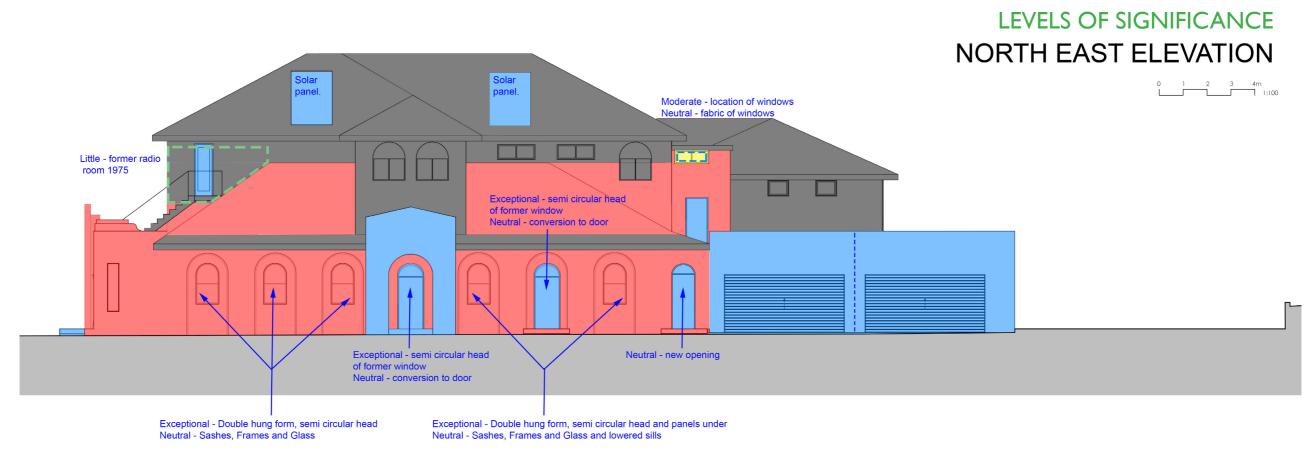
LEVELS OF SIGNIFICANCE OF BUILDING - ELEVATIONS Diagram showing the overall levels of significance of fabric on the north west and north east elevation. This diagram does not cover detail such as every window or door or joinery, rather the overall form and materials. Table 6.9 should be referred to for detailed information about each space and item. Source: JRA annotations on TZG plans.
